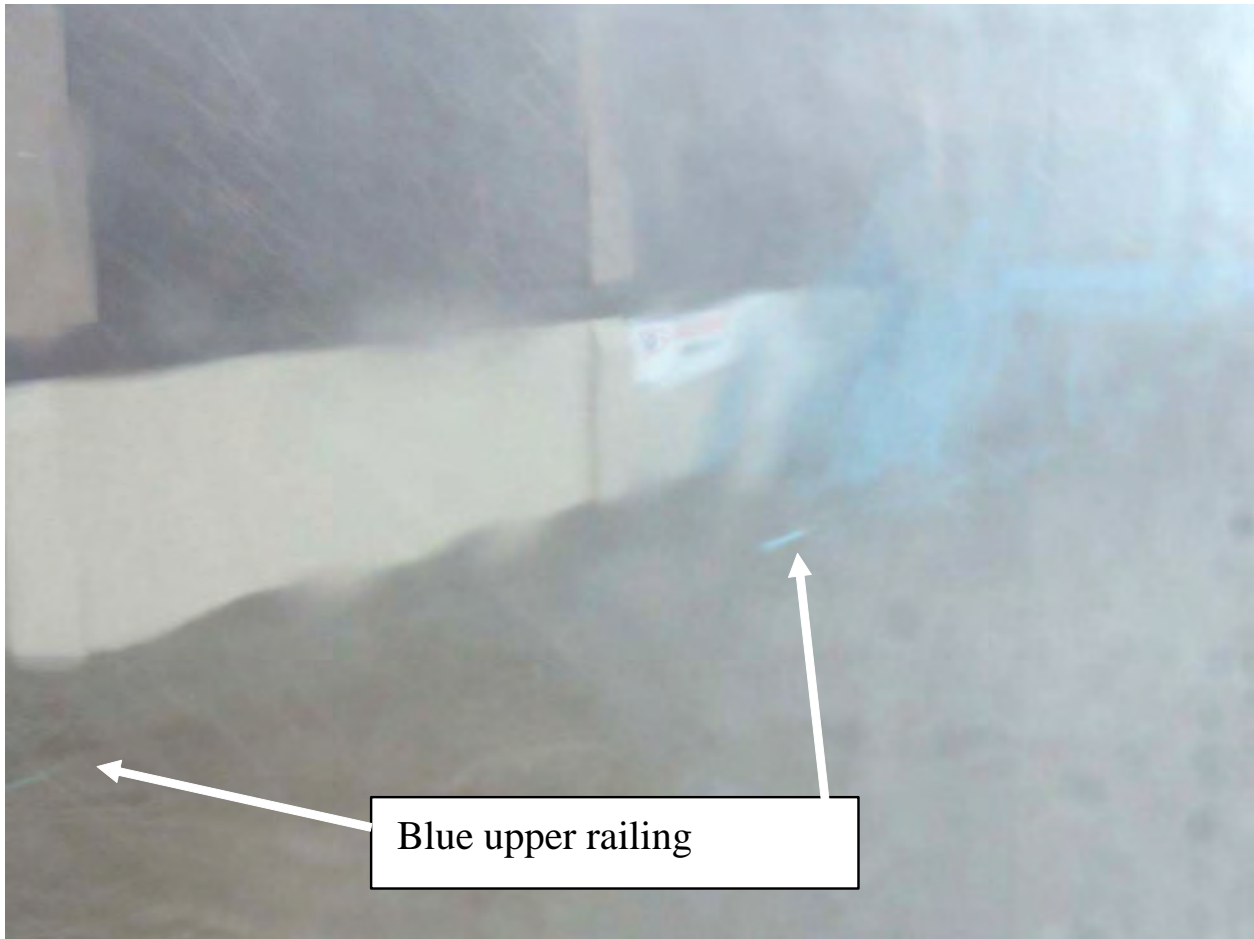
Picture DSC02241.JPG taken at 0826:36 (CDT) on 8/29/05, elevation 9.1 ft. Looking south. Water level at upper rail. Brightness and contrast adjusted.
